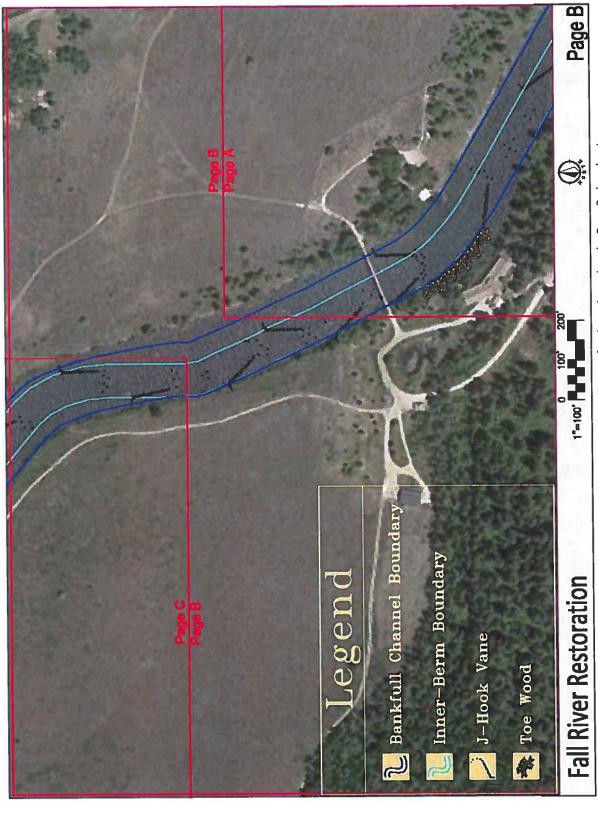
Plan view detail of the proposed fish habitat enhancement for Fall River for the enlarged-scale, Page B plan sheet.
